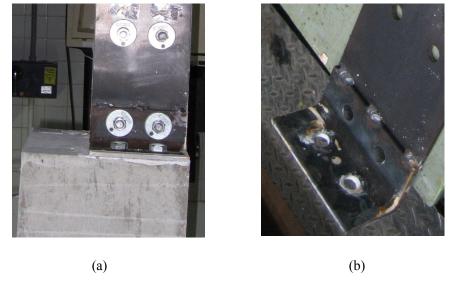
Joint at the end of precambered steel plates; (a) Anchor bolts details; (b) Steel angle details
